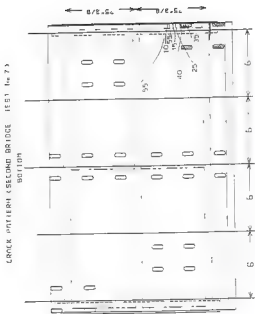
Bottom Cracking Pattern (Second Bridge - Test No 7)
